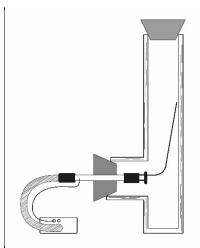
Installation of the probe through the chimney door, bending the probe.
